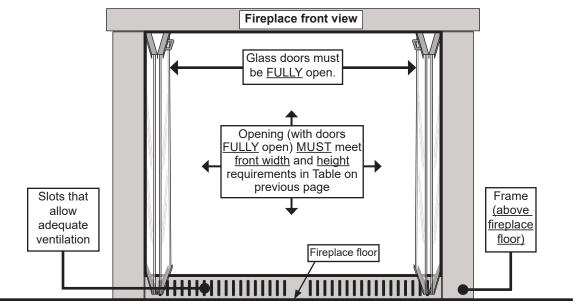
Correct glass-doors frame setup, ventilation, and use (if applicable)
